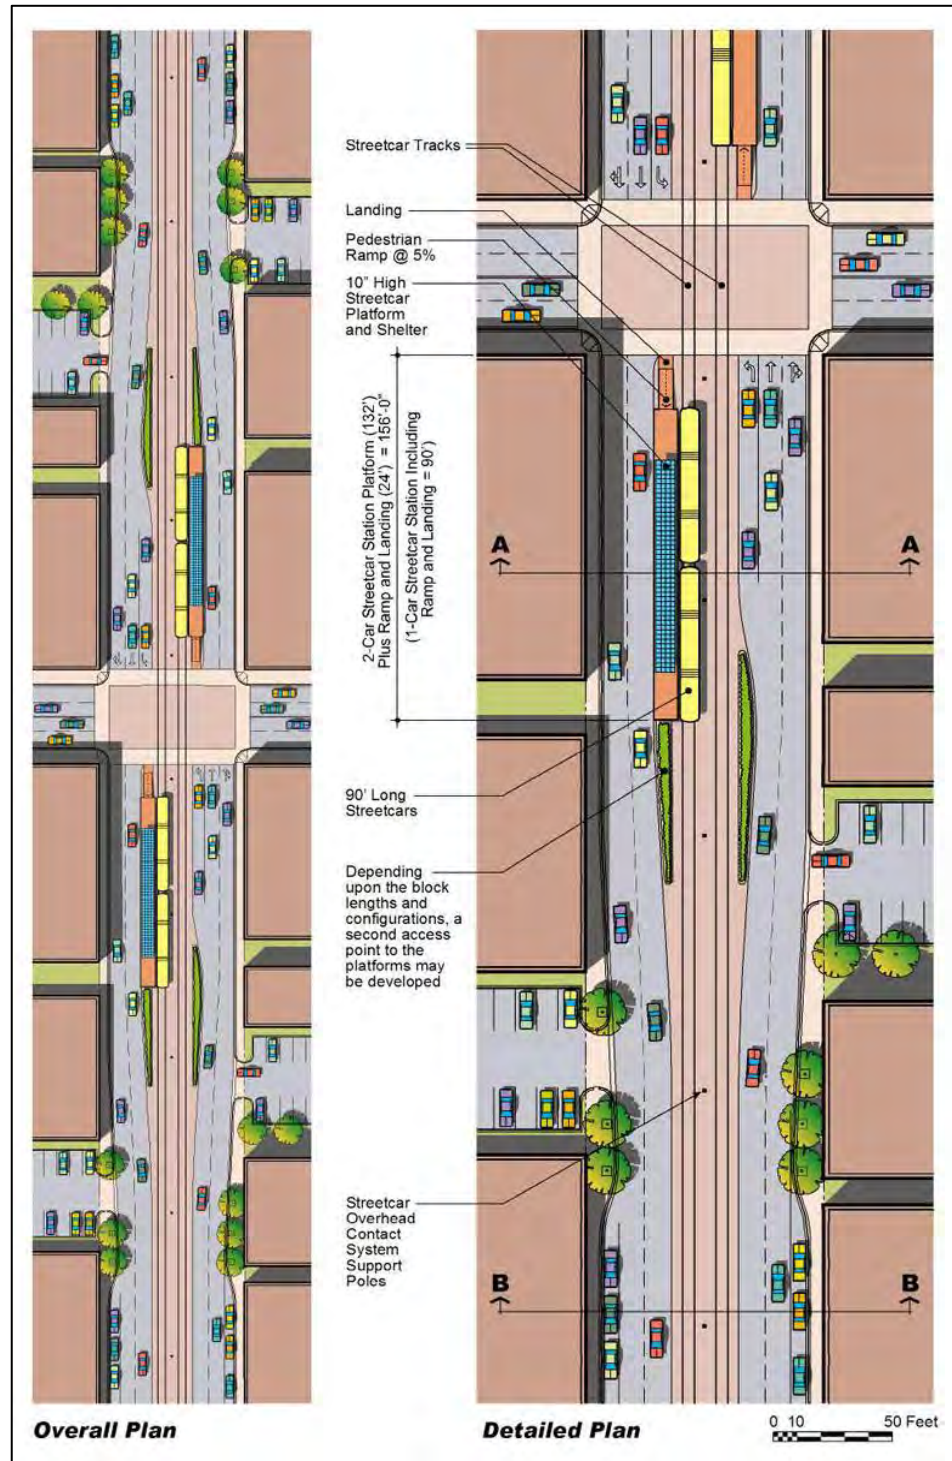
Streetcar Configuration with 100-Foot Right-of-Way (Plan View)
